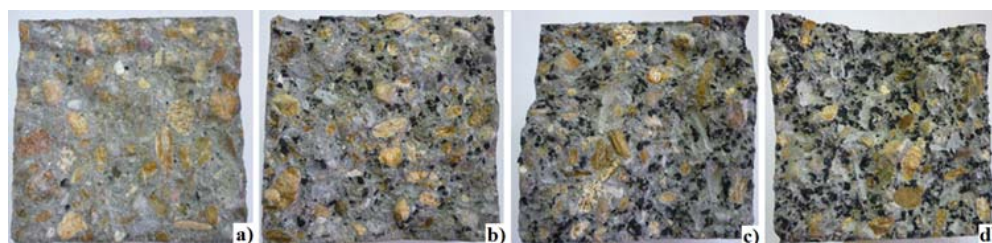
Concrete samples crack surface at bending a) benchmark concrete, b) concrete with 10% , c) 20% and d) 30% of rubber granulate
